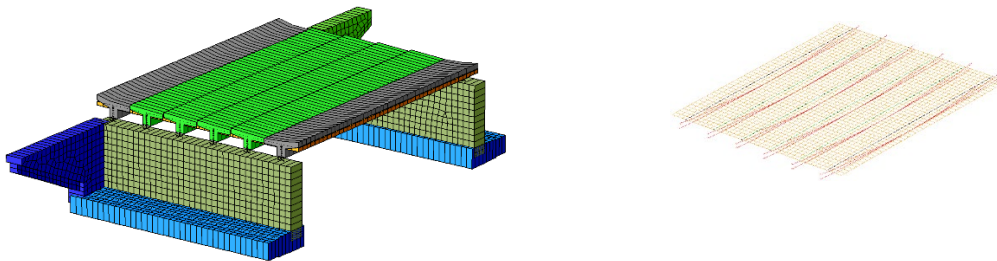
Finite element model (left) and implemented tendons (right) for the case study bridge #1
